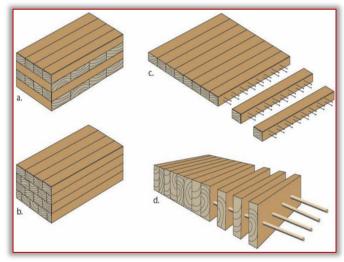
Laminated Timber types: (a) Cross—Laminated Timber (CLT); (b) Glued Laminated Timber (GLT); (c) Nail—Laminated Timber (NLT); (d) Dowel—Laminated Timber (DLT)
